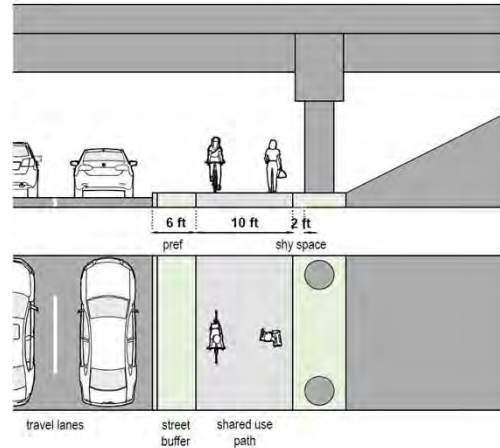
Side Path between Travel Lanes and Bridge Piers with Preferred Buffers
